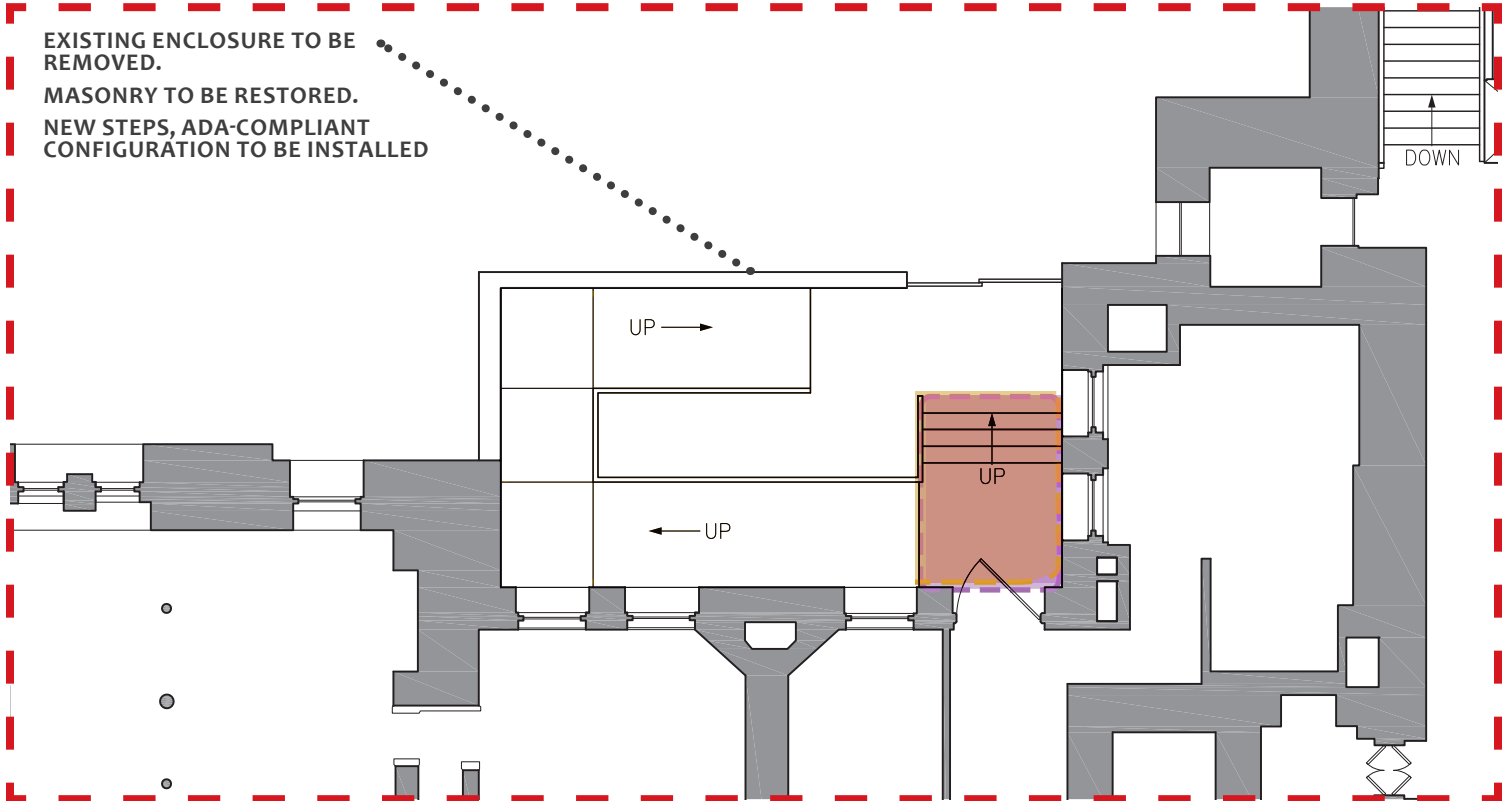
Enlarged “As-Found” Basement Level Floor Plan and the Northwest Exterior Storefront Entrance.
